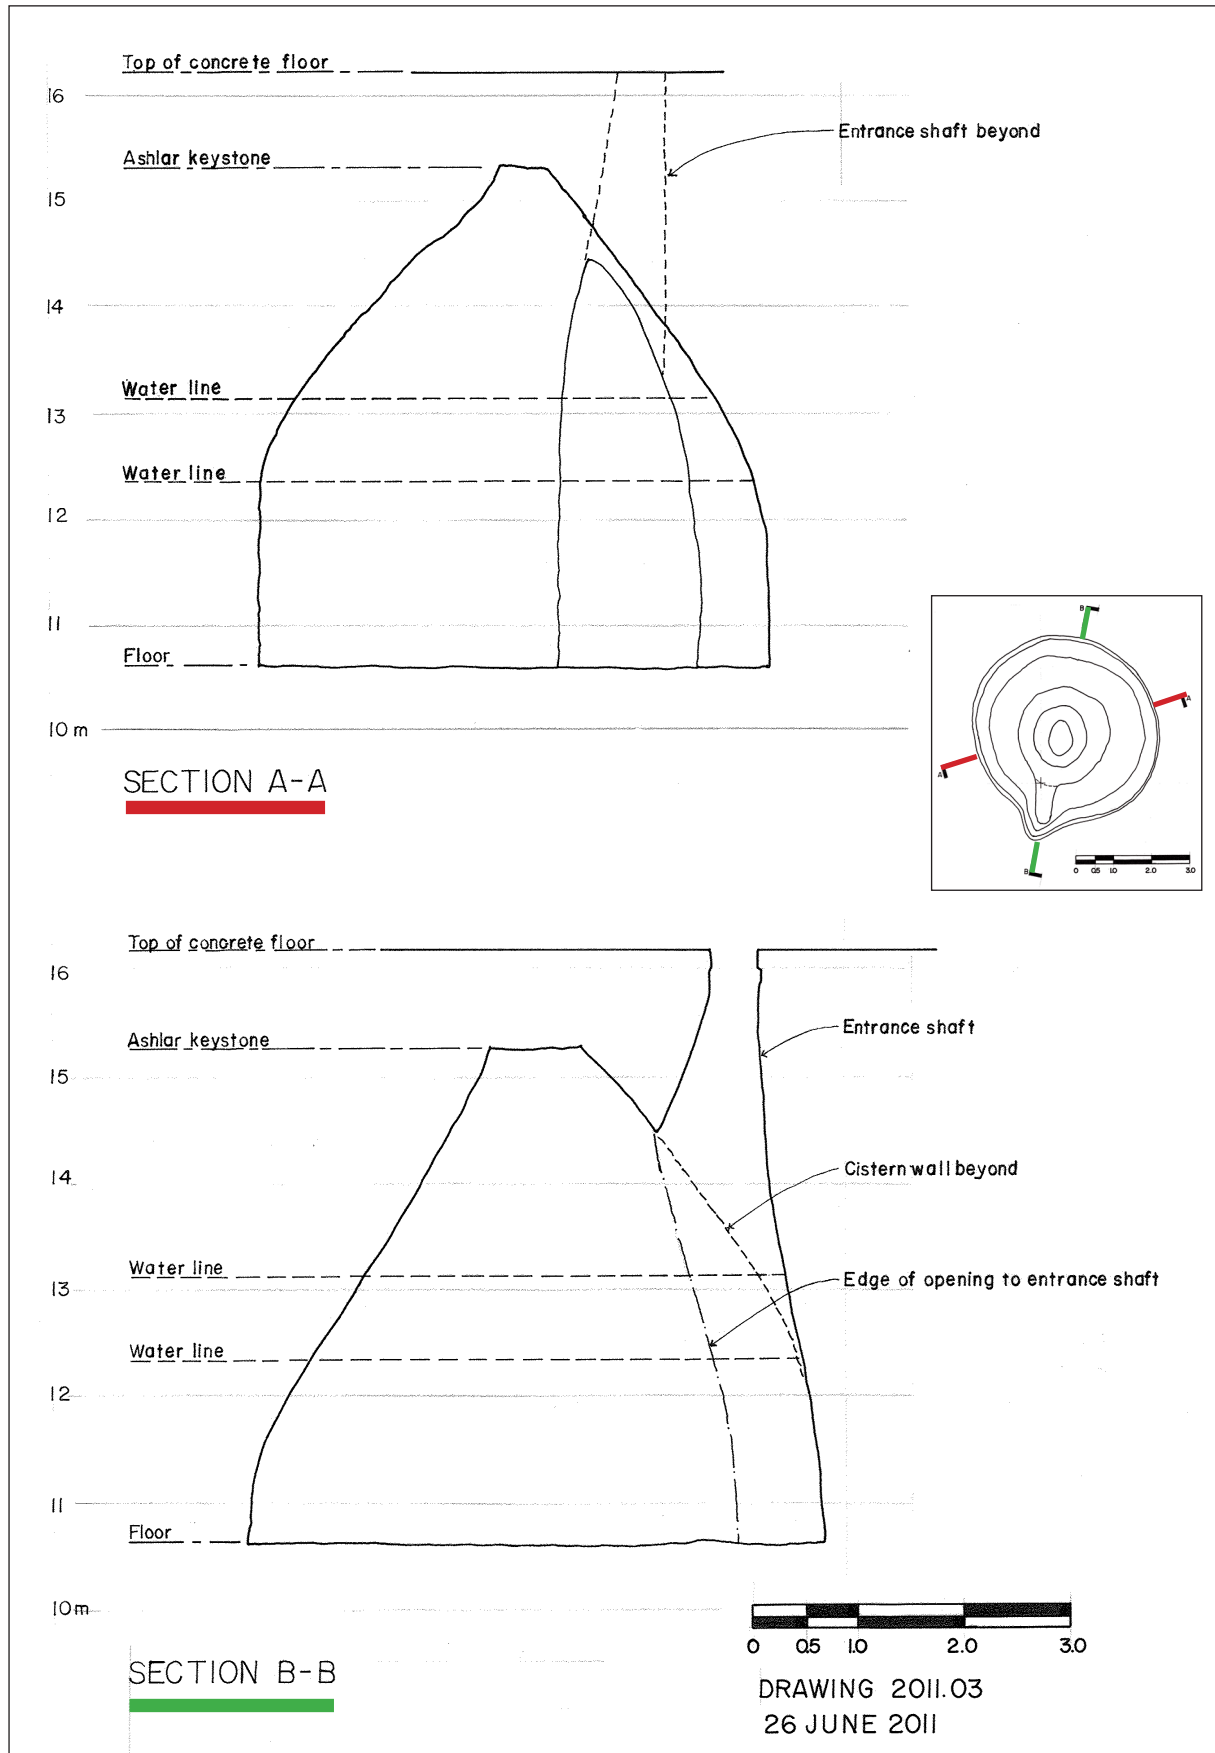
Plan and section of cistern (drawing by Kelley DesRoches Cotton and Krista Ziemba).
